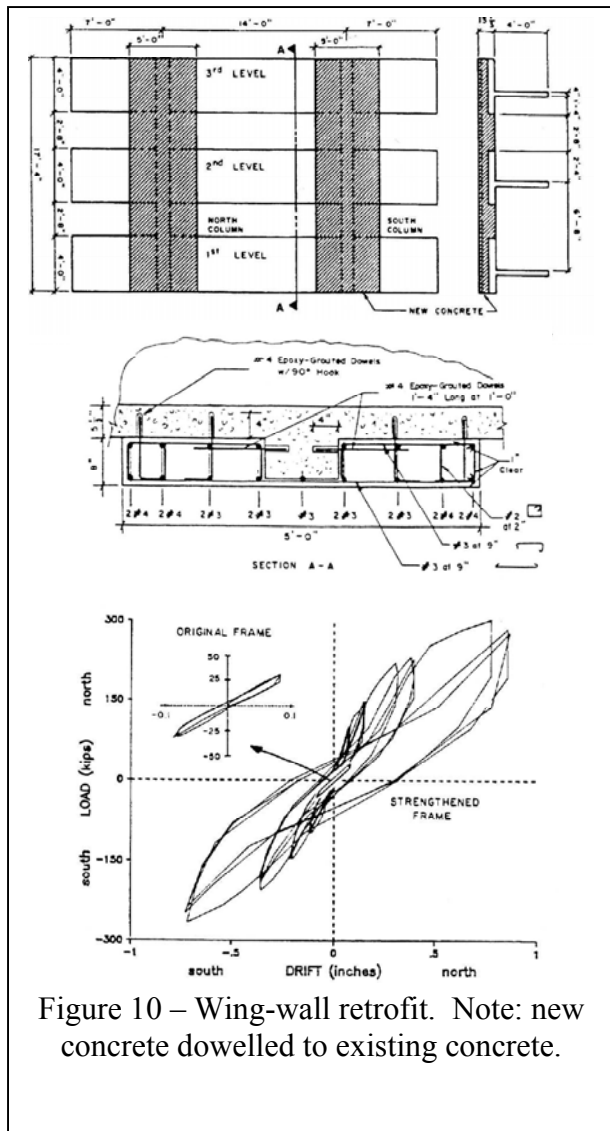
Wing-wall retrofit. Note: new concrete dowelled to existing concrete.
